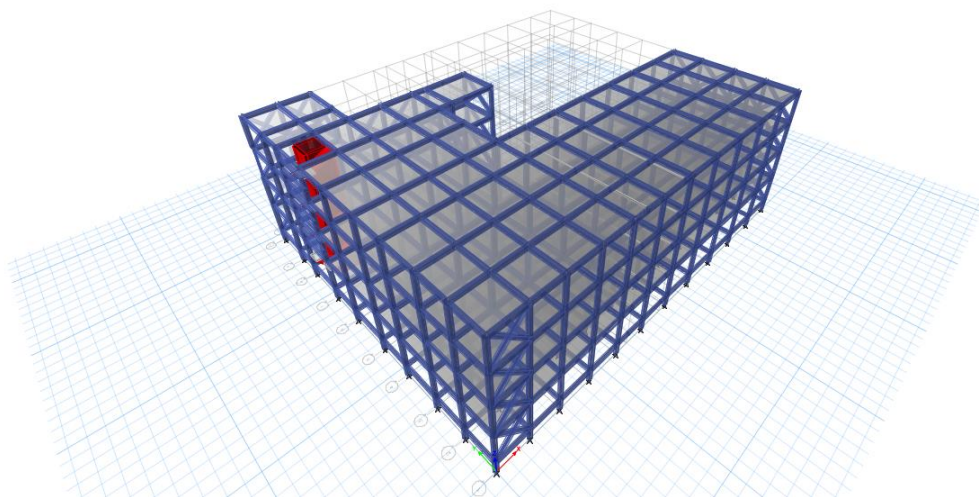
1 FE Model of RC building with bracing (RMG Factory)
